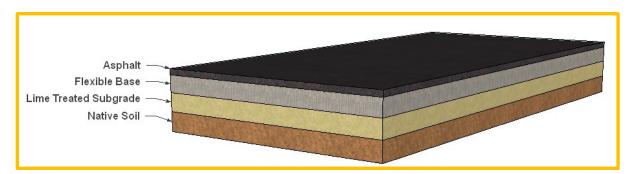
OPTION 1 FLEXIBLE PAVEMENT TYPICAL SECTION
